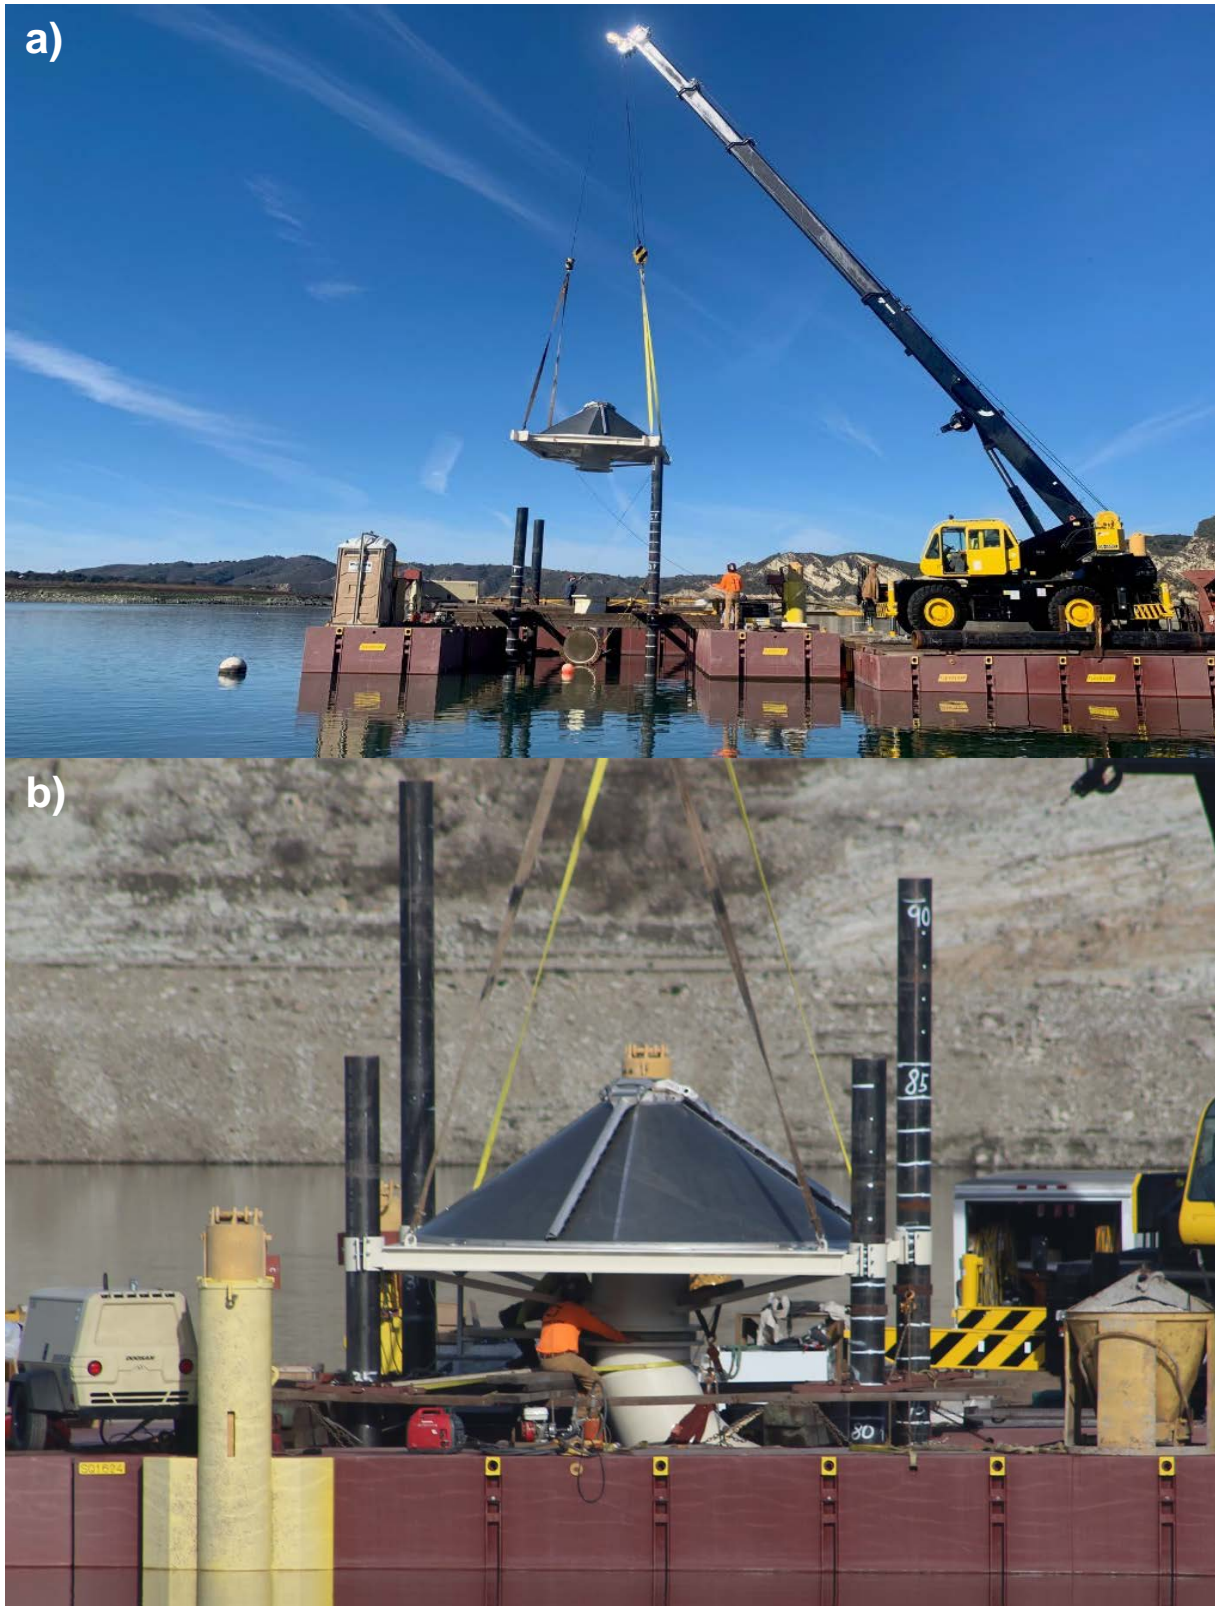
a) contractor setting up to drive piles at the intake tower on the 1/2/23 holiday with the lake at 693.58'; b) intake tower on 1/10/23 following 12.5" of rain at Cachuma Lake which resulted a 32.25' rise in a 24-hour period which exceeded the previous historical single day change by 10 feet.
